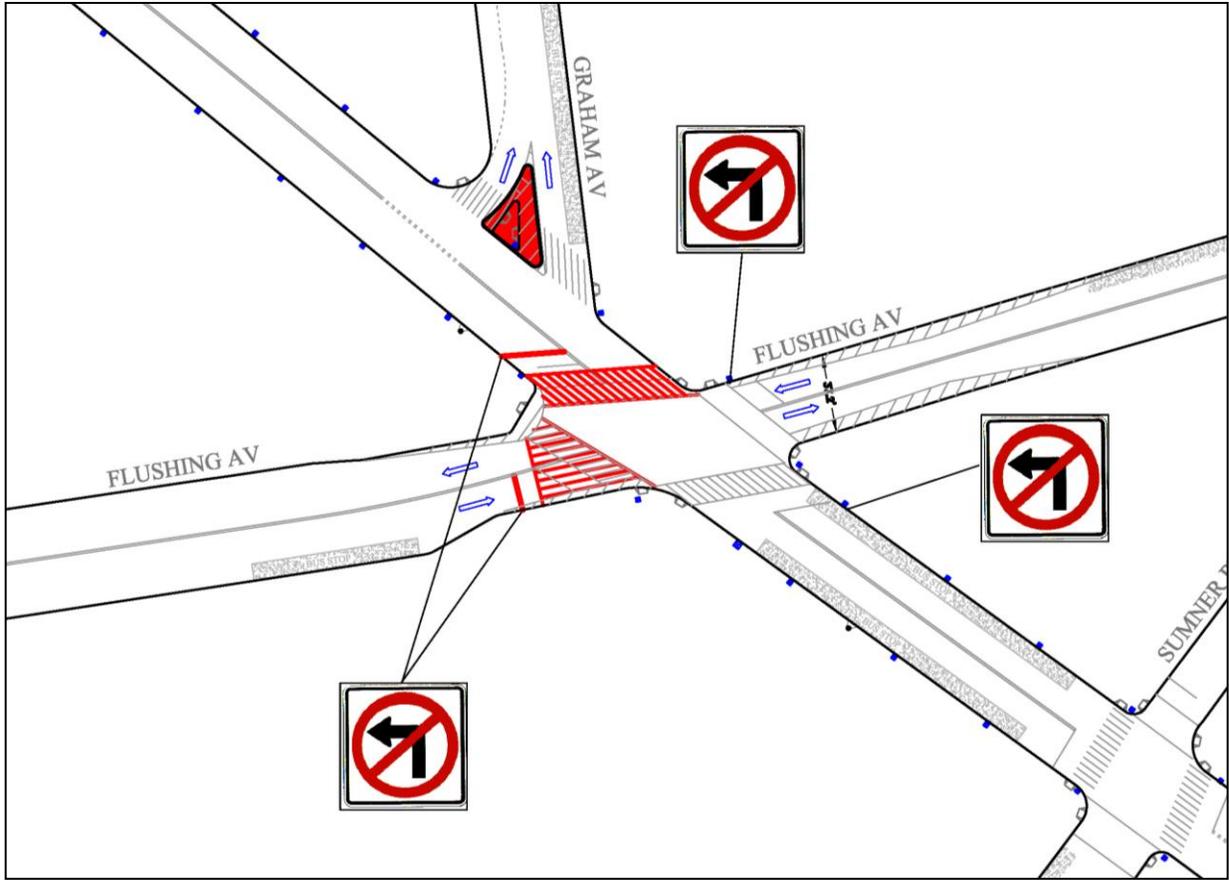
Proposed Crosswalks and Concrete Islands at Broadway and Flushing Avenue
